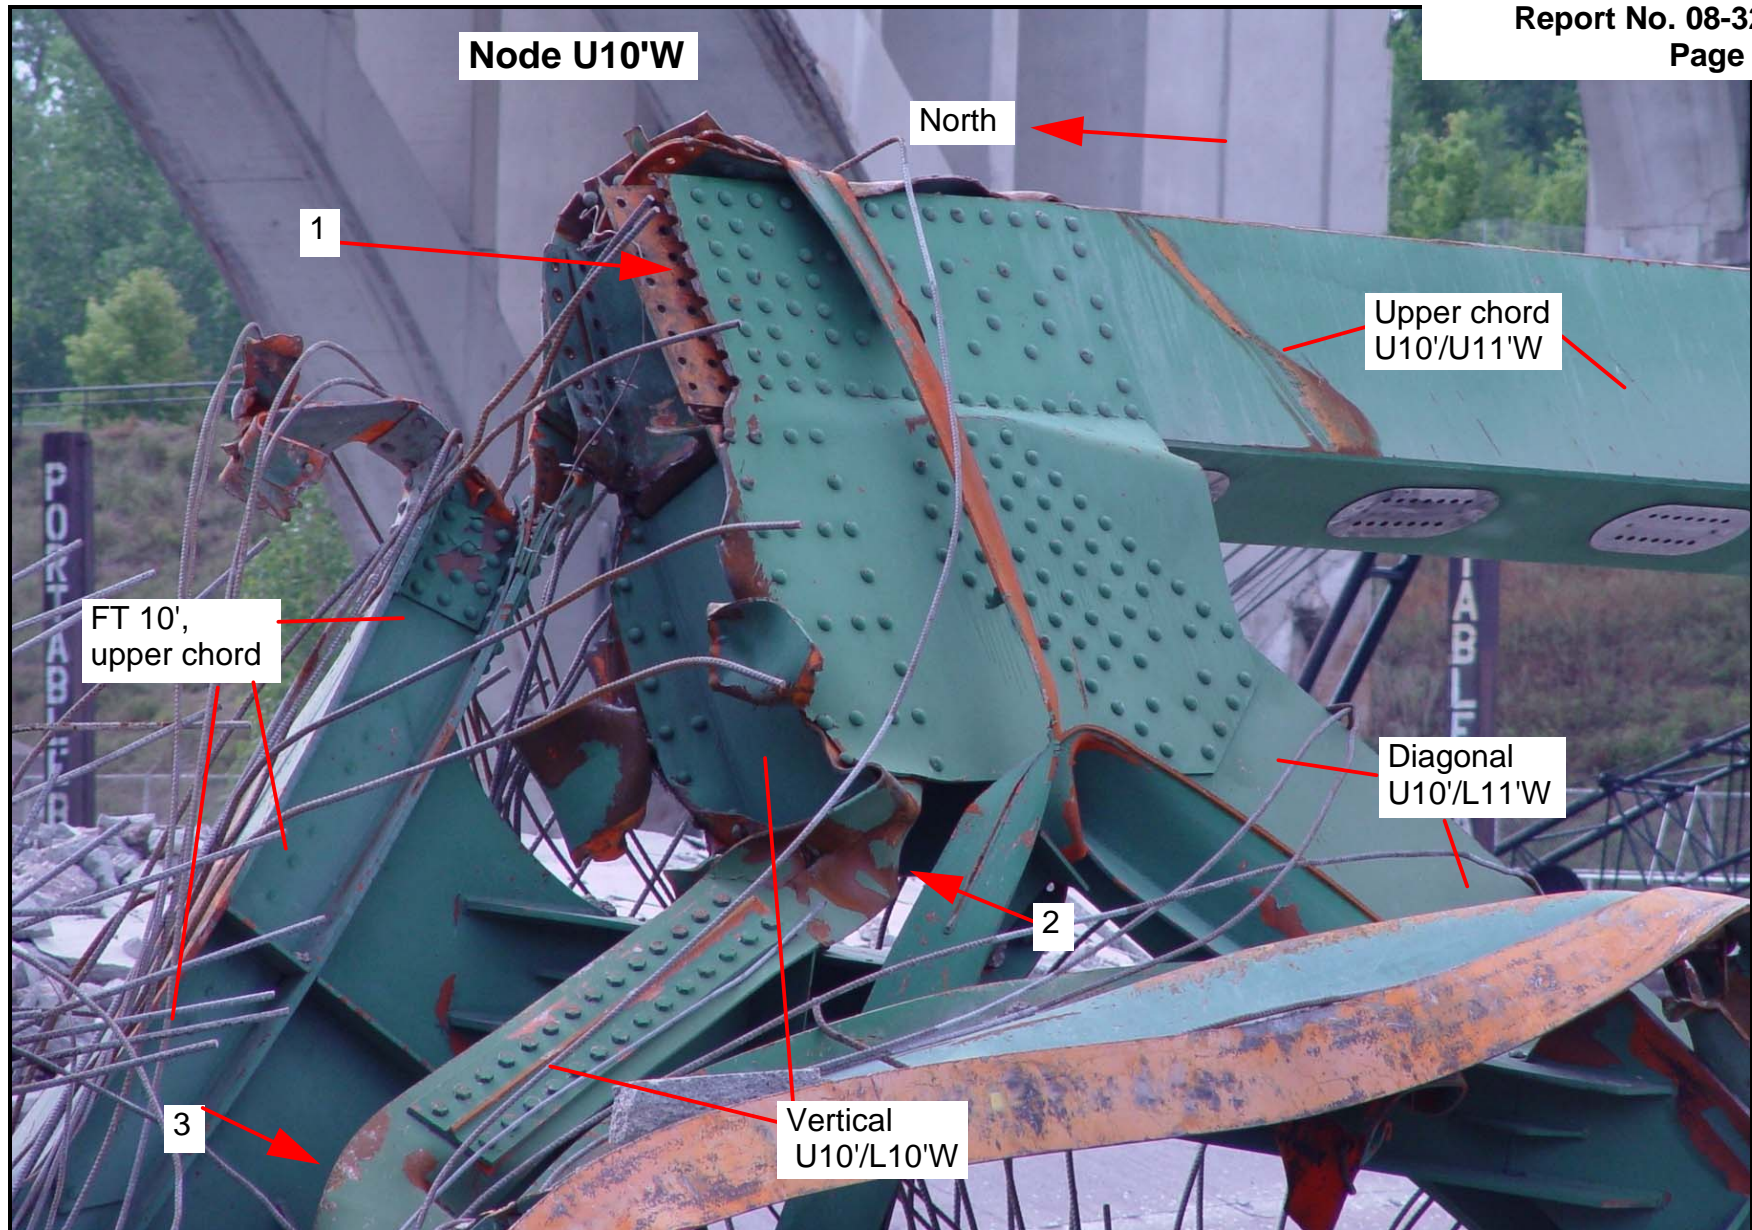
Fractured and deformed west gusset plate on node U10' East.
